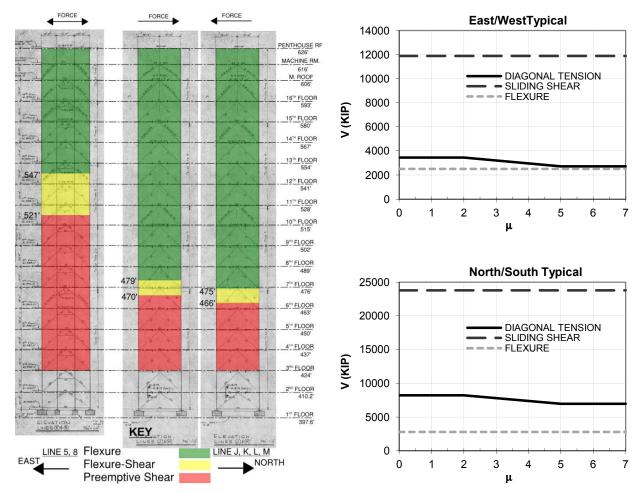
Behavior modes of the Elevator tower walls expressed in terms of height of the resultant seismic force.
